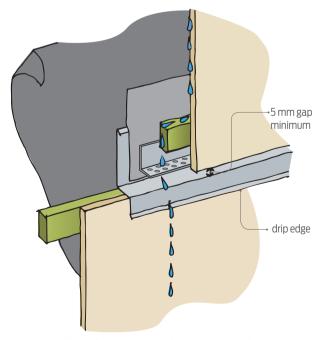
Water held by surface tension must be able to exit via the 5 mm drainage gap over a flashing.
